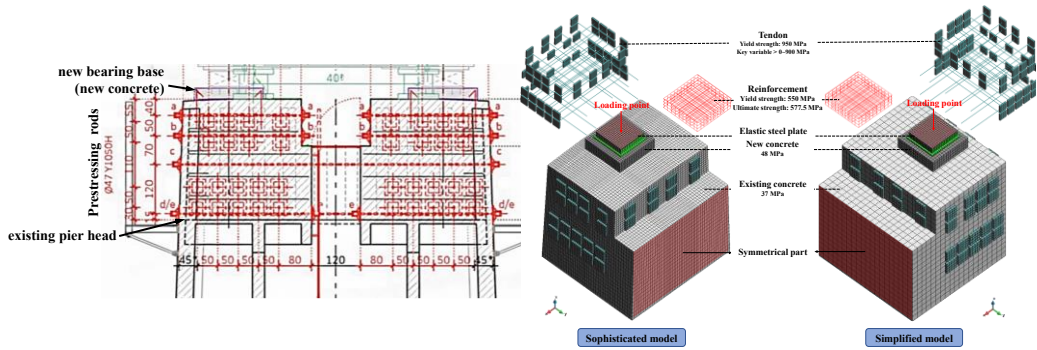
Strengthening measures applied to the reinforced concrete substructures
